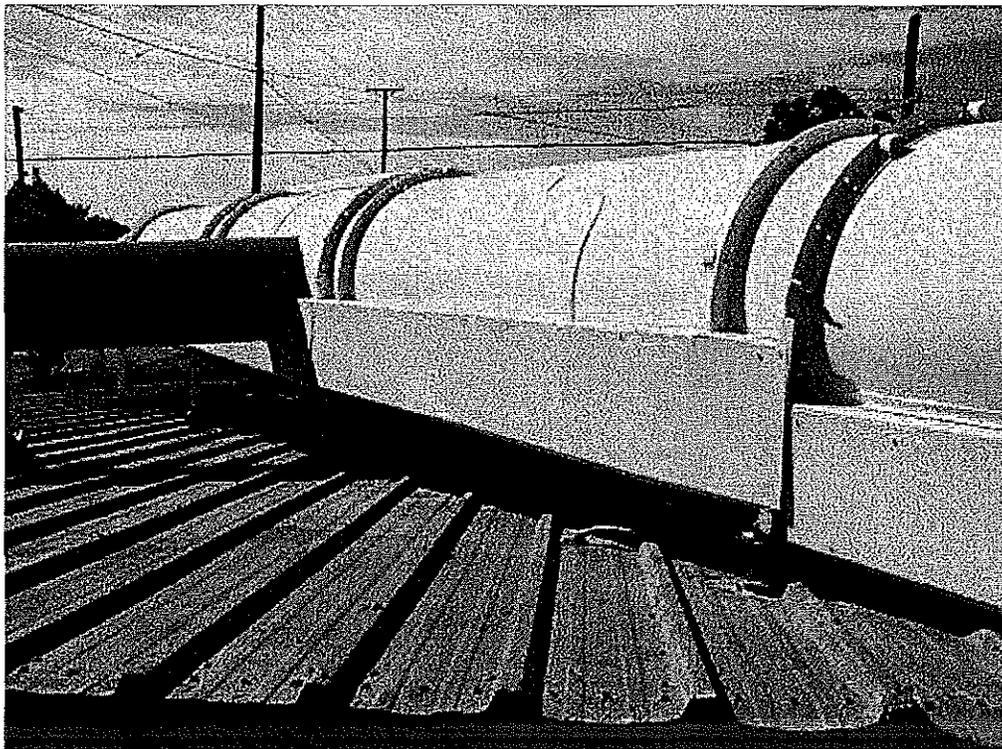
(Photo 8) : Looking south, towards the south end of the east roof.
